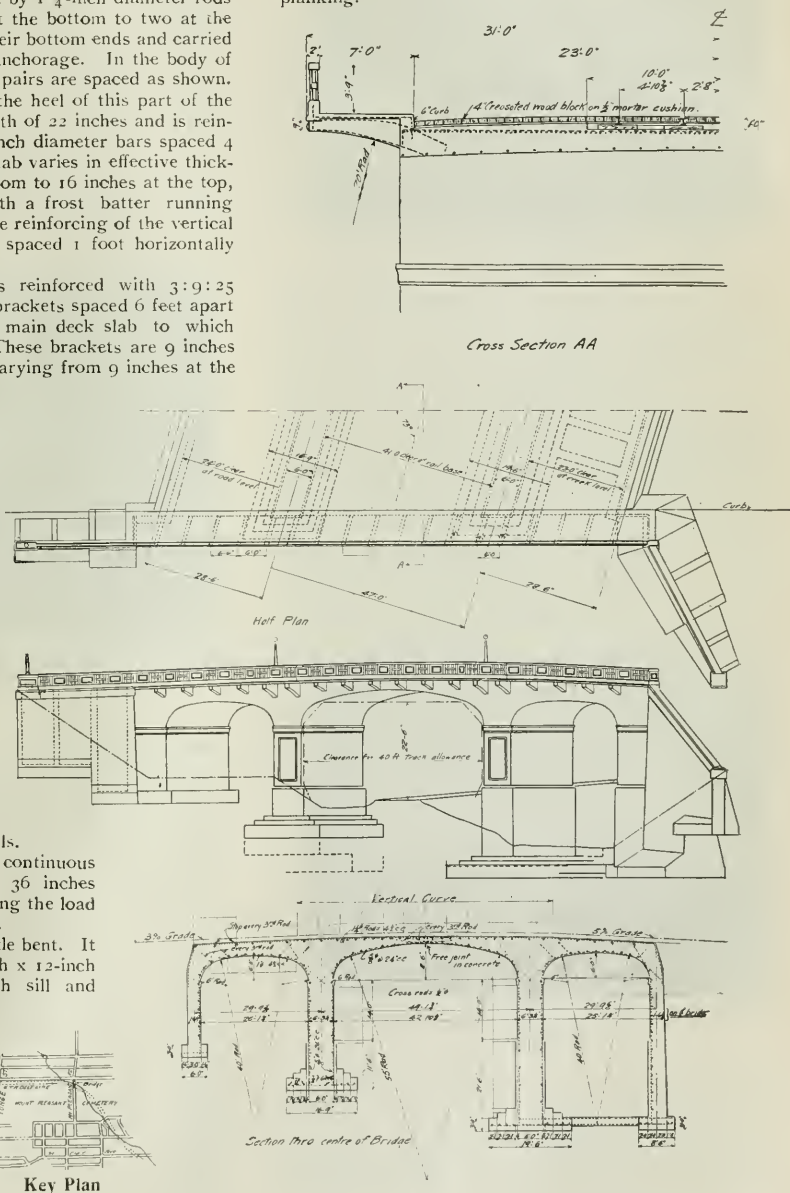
Half Plan, General Elevation and Longitudinal Section
